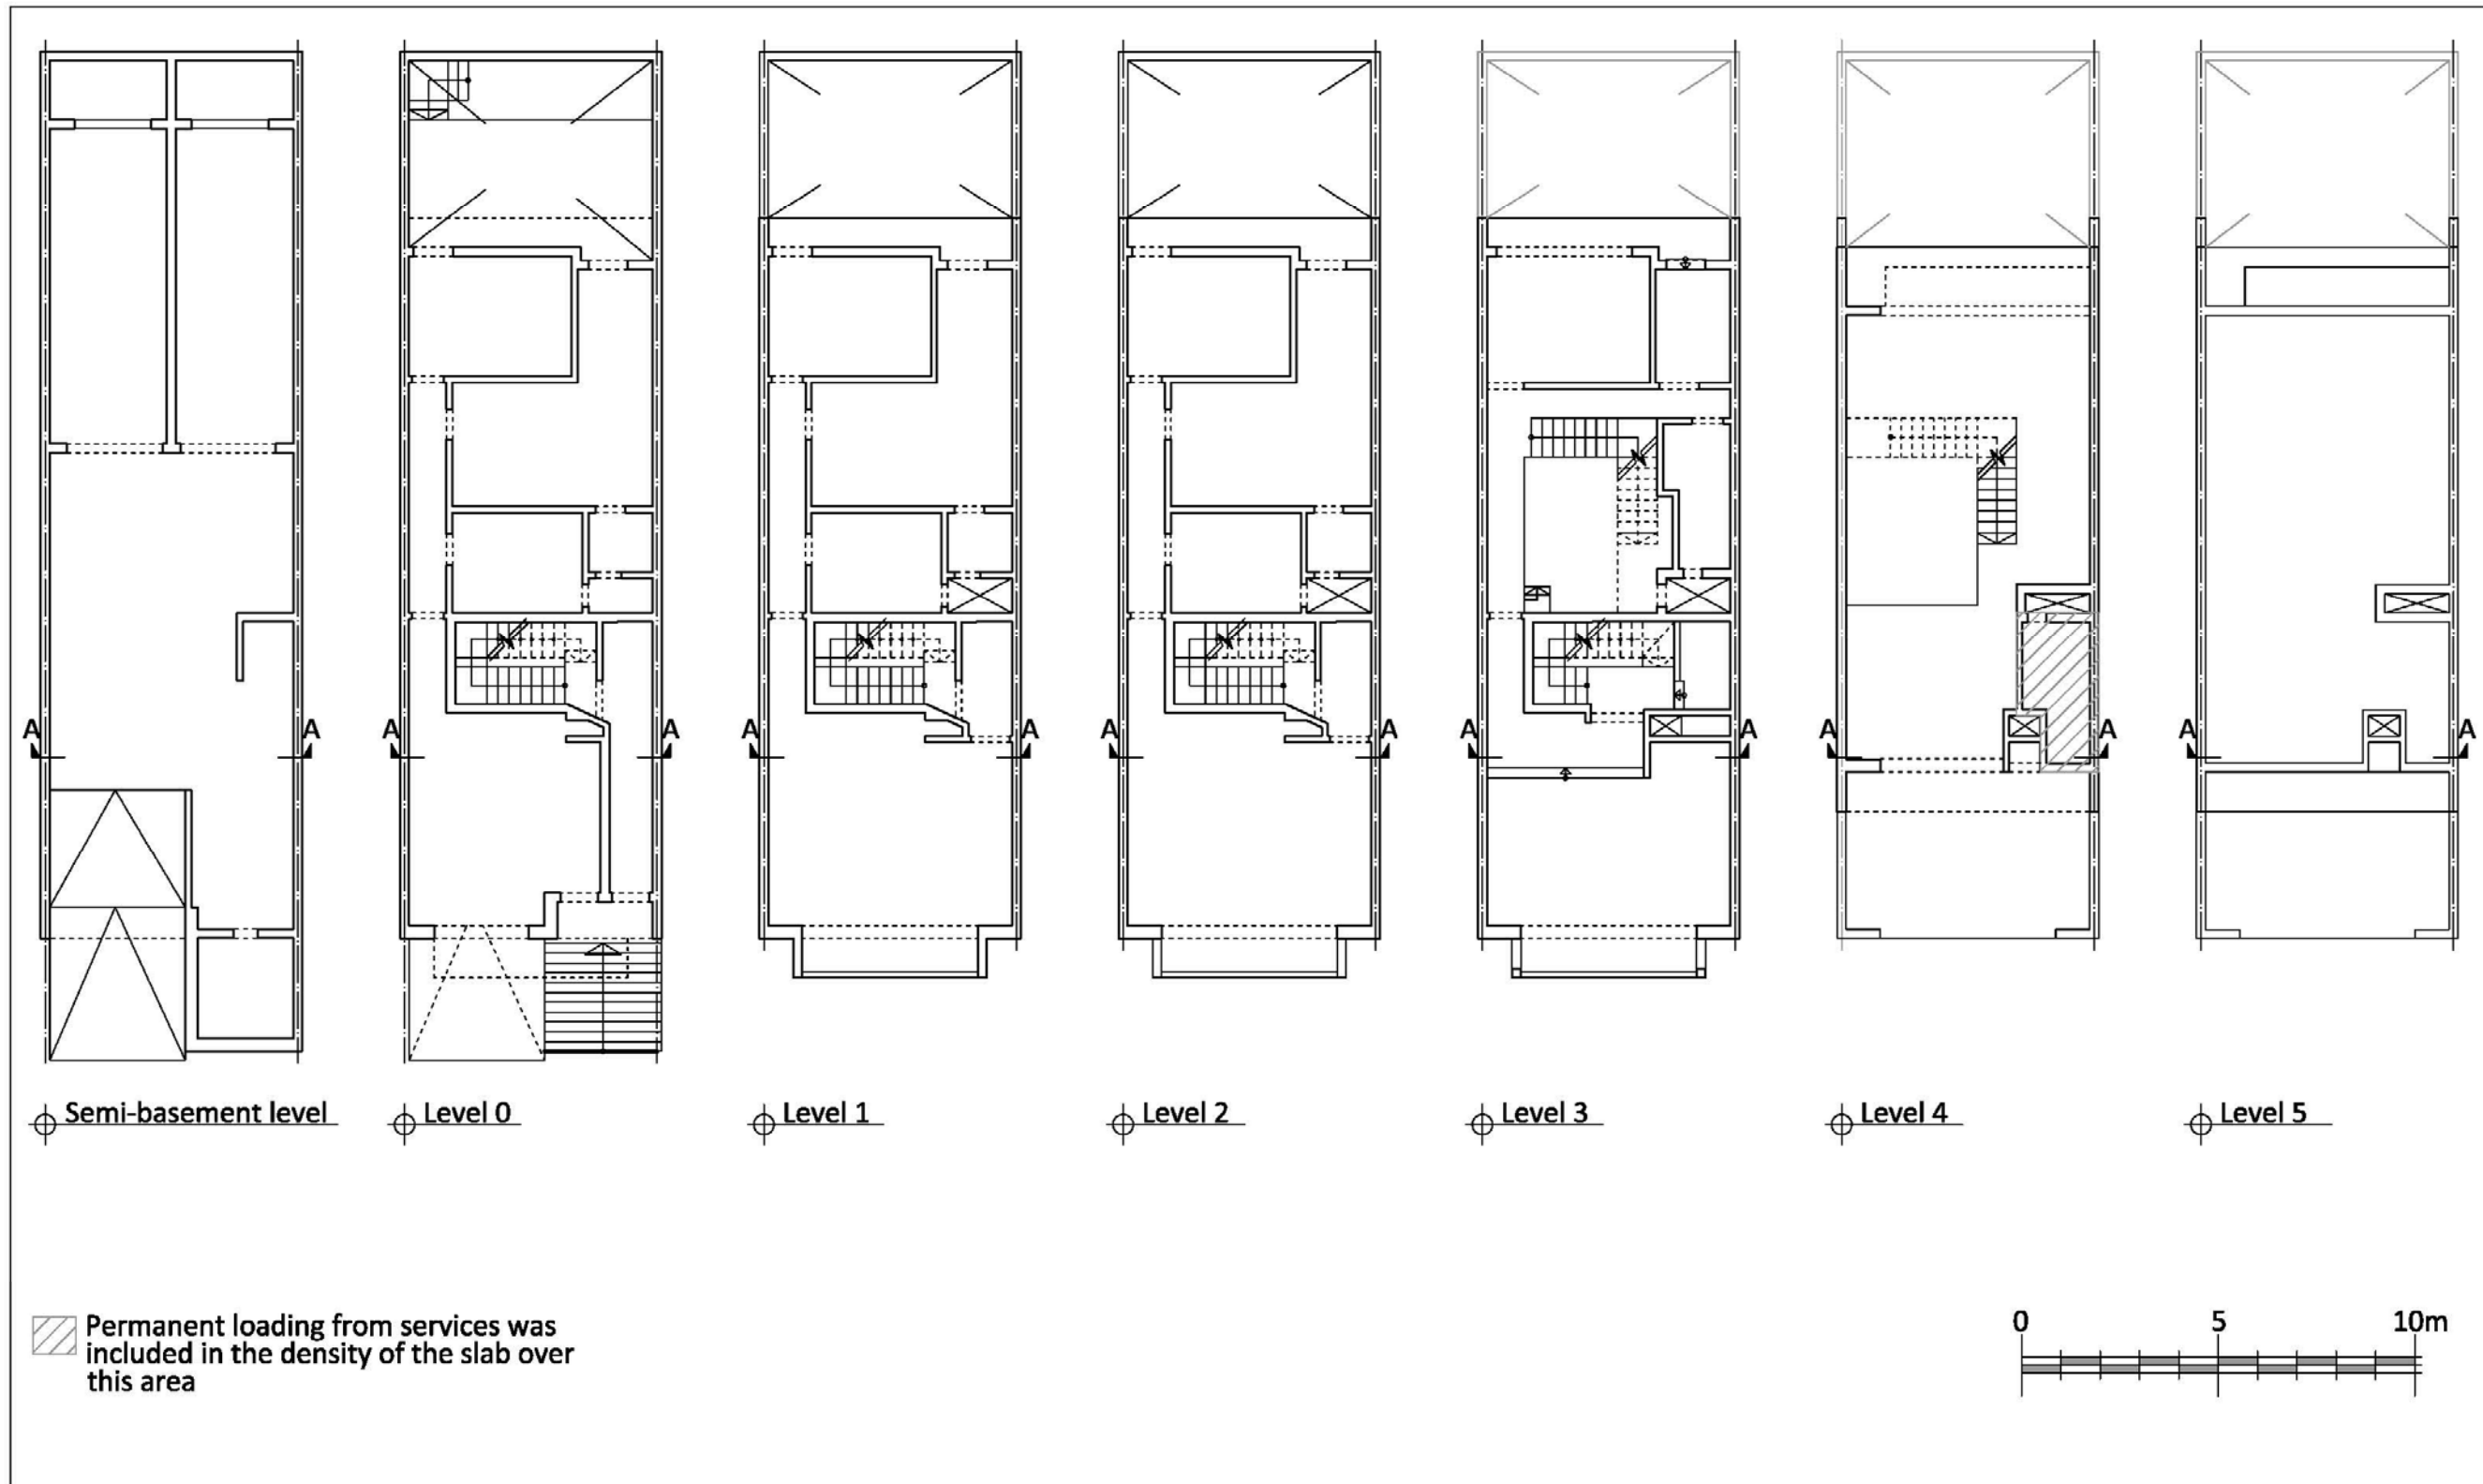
Plan layouts at all levels of Xemxija Building Number 0011 (from Development Permit Drawings).
